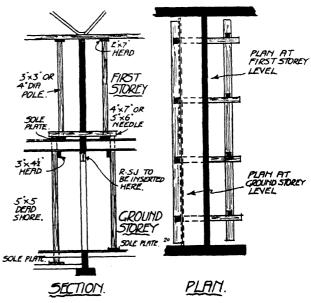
(above).—A SIMPLE SYSTEM OF DEAD SHORING TO AN EXISTING WALL IN WHICH A LARGE OPENING IS TO BE FORMED
